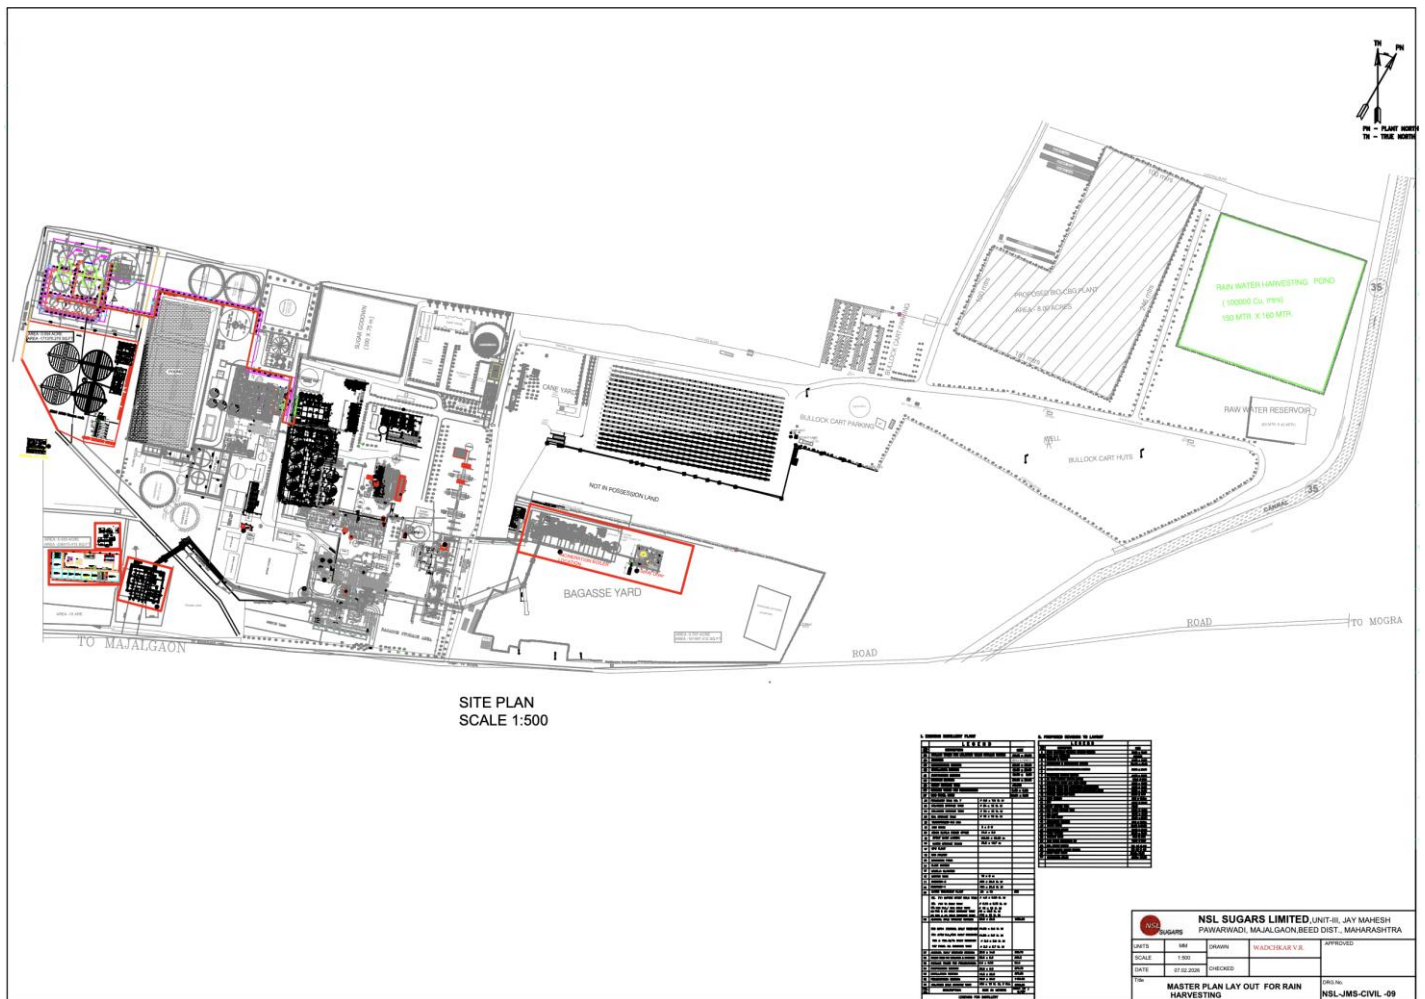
Plant Layout for Rainwater Harvesting at NSL Jay Mahesh Unit
